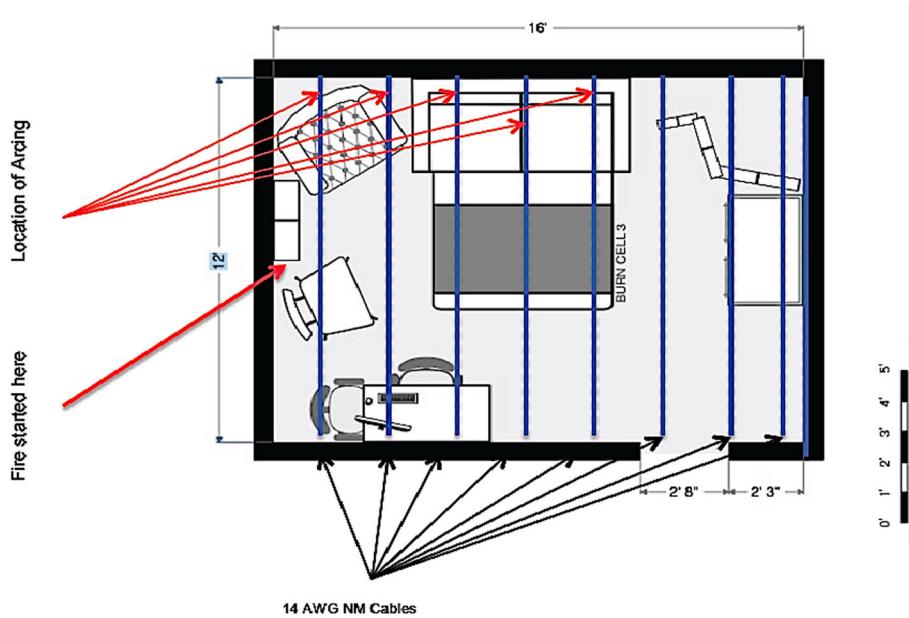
Results from Wheeler's Test No. 3 (all cables protected by 1/2-in gypsum wallboard). Diagram: David M. Wheeler.
